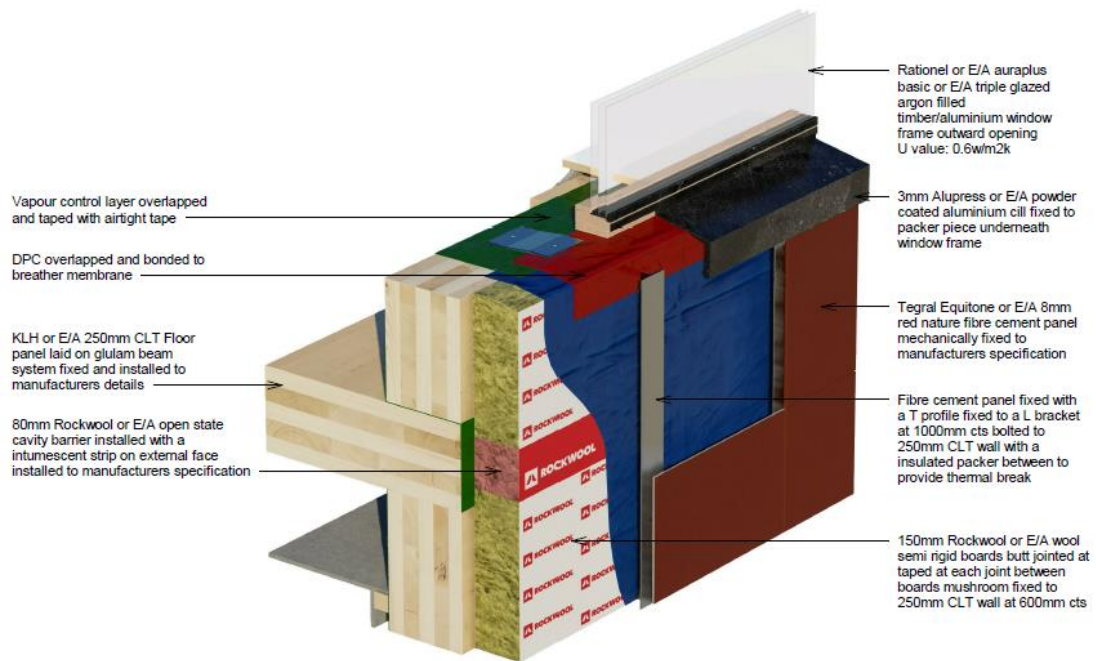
SketchUp and Lumion generated 3D intermediate floor/ window cill detail
